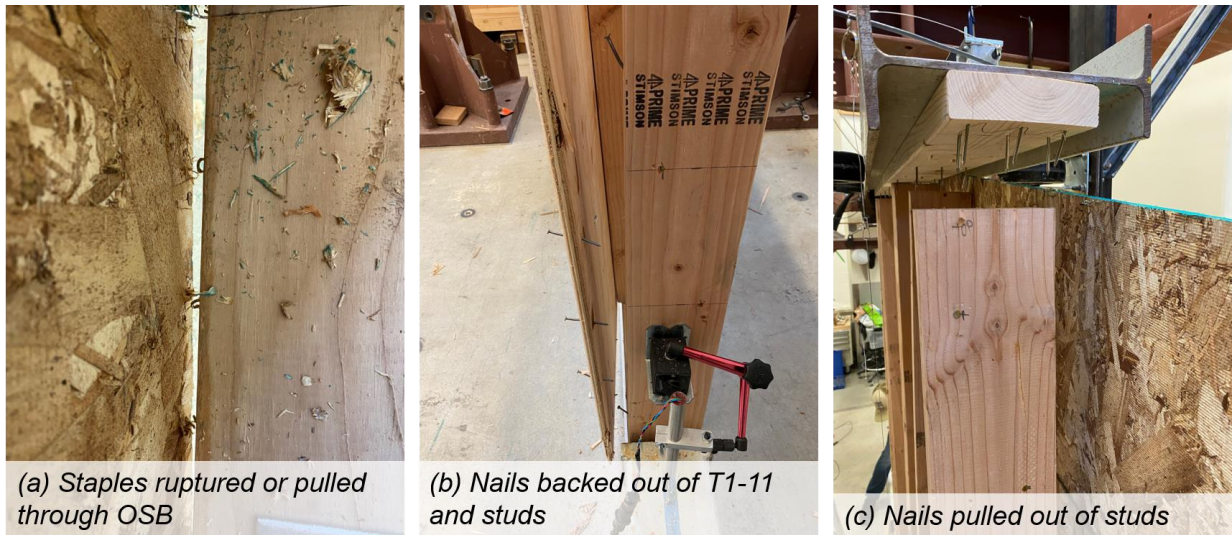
Failure mechanisms in wood-frame wall assemblies.
